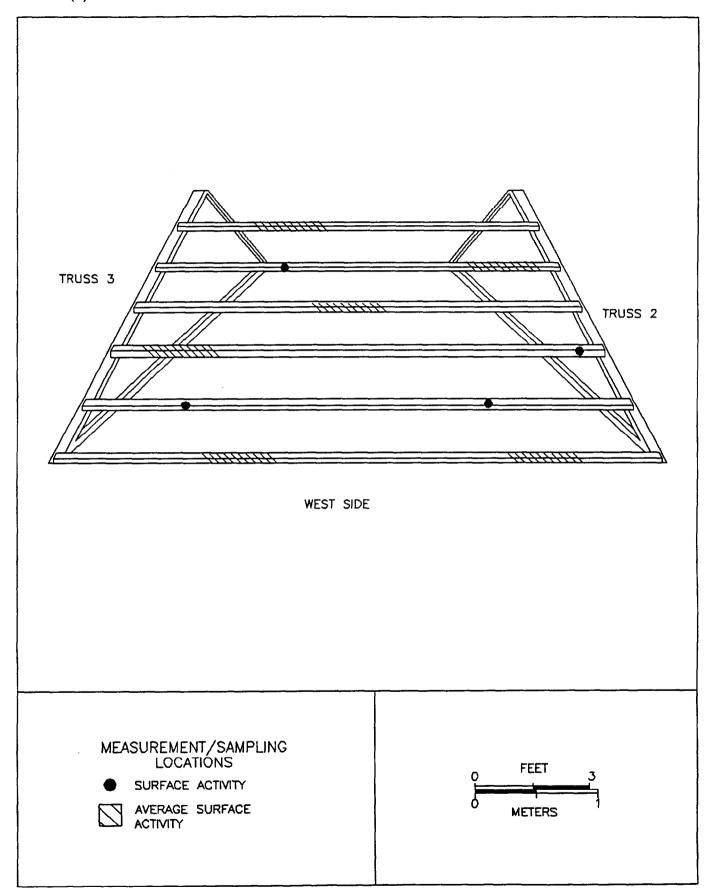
Building 3, Bay 2, West — Measurement and Sampling Locations
